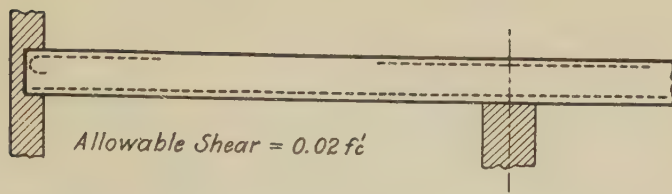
Typical Reinforced Concrete Beam; Principal Longitudinal Bars without Special Anchorage.
